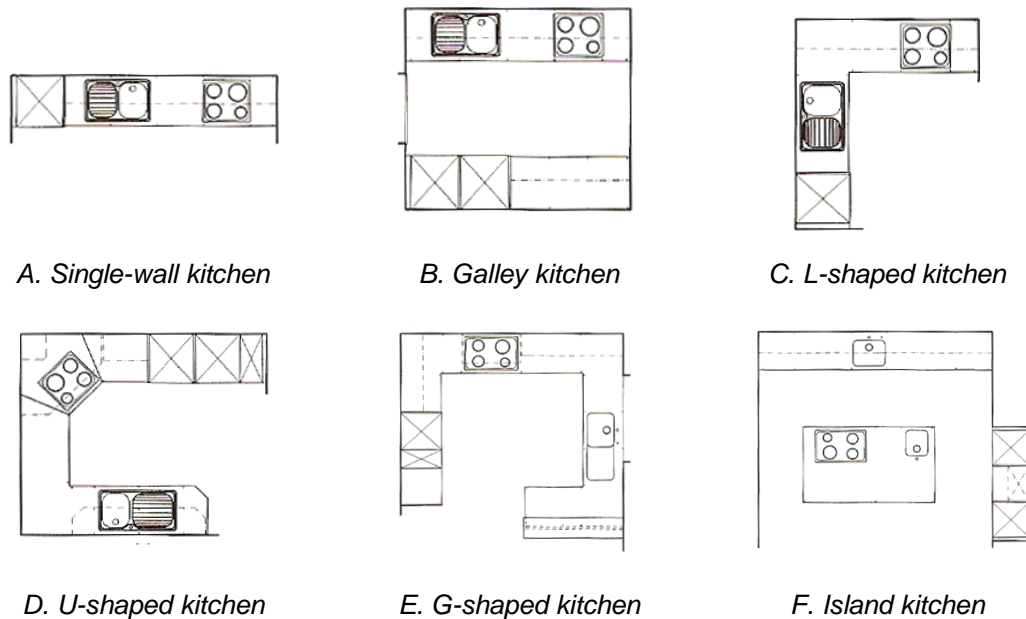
Kitchen Floor Plan Types (Spechtenhauser, 2006)
